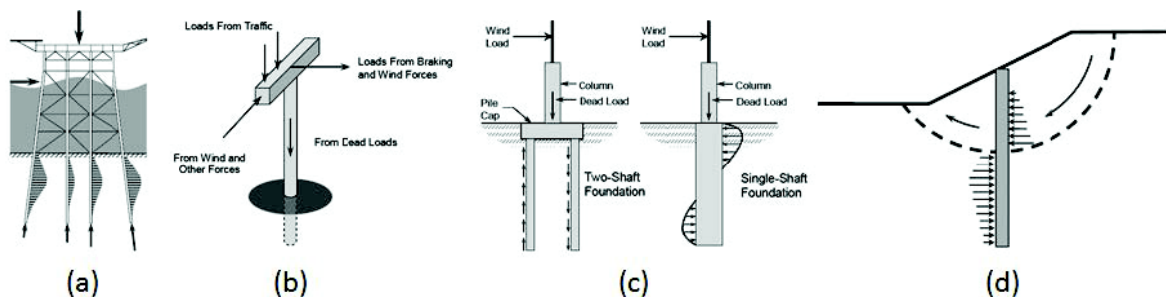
Laterally loaded pile foundation applications: (a) Offshore applications, (b) Single pile support for a bridge, (c) Pile supported overhead sign, (d) Piles to stabilize slopes [1].
